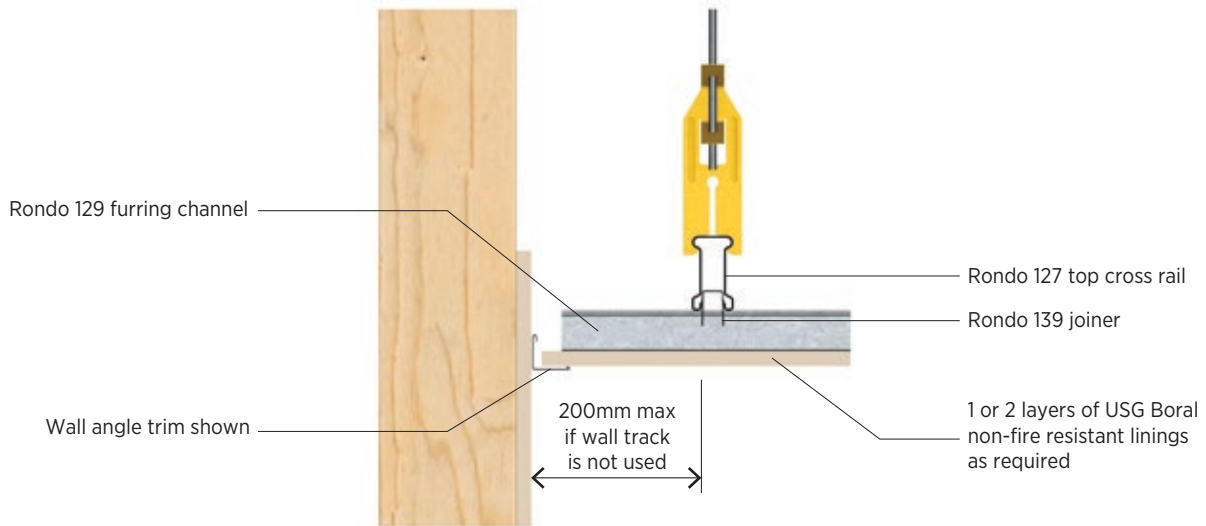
Typical Perimeter Detail - Section Through Top Cross Rail
